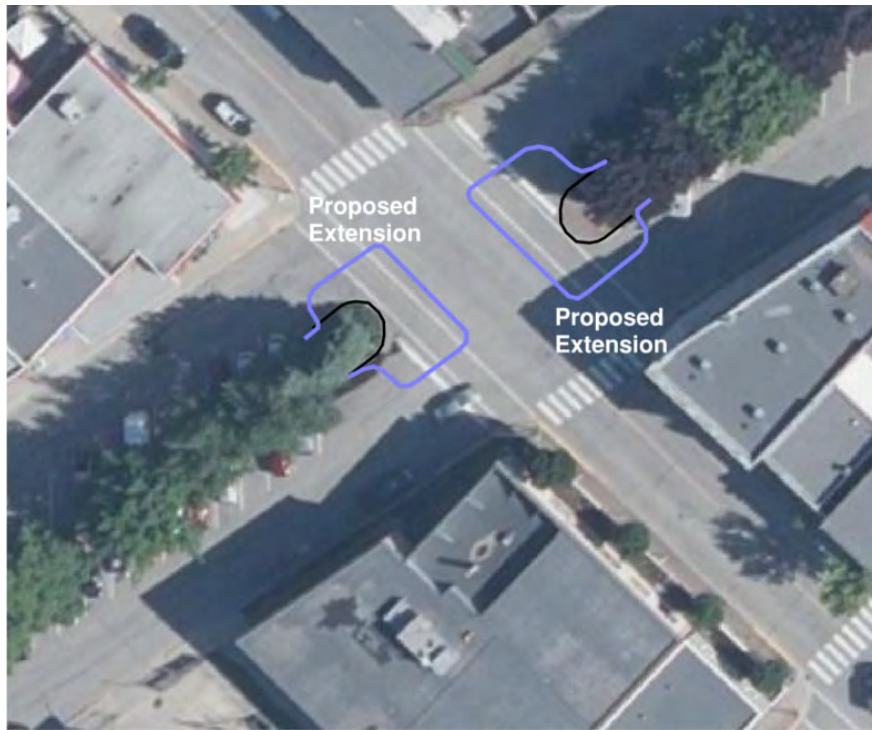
Existing Pedestrian Crossings at Campbell Street & 1st Street
